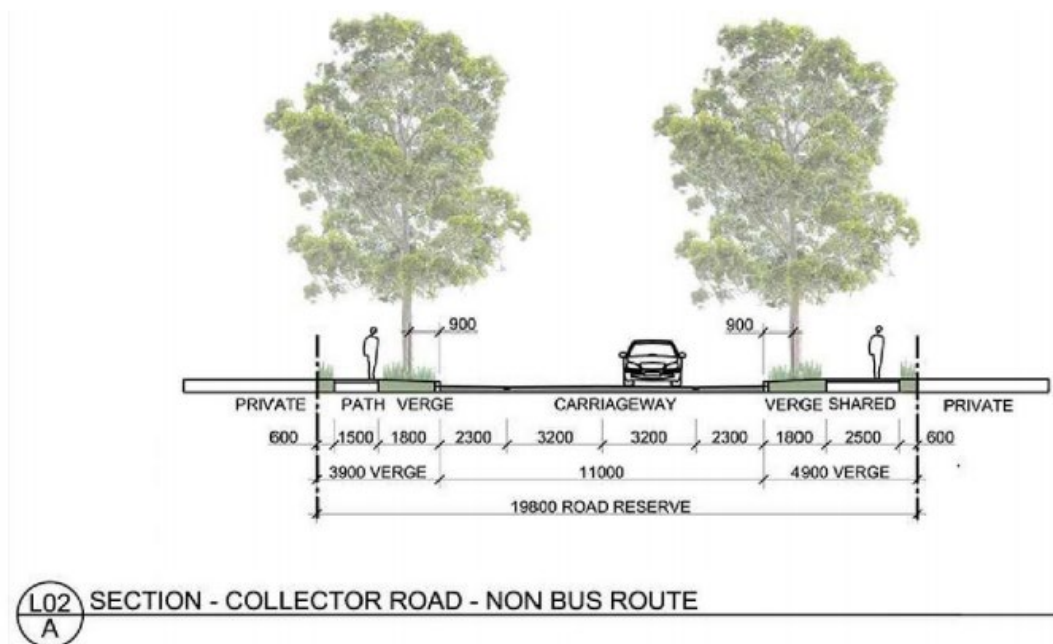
Typical Road Sections - Collector Road (Non Bus Route)
